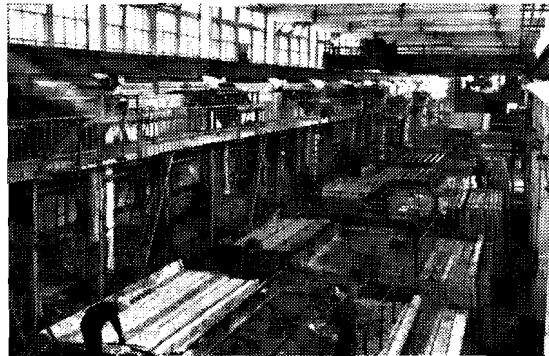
Cassette method of manufacturing precast reinforced concrete elements (house building plant, Moscow).
